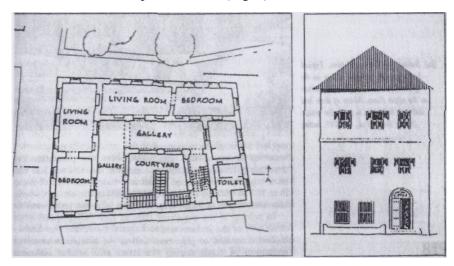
Floor plan and aspect of an Arabic house Source: Sheriff, Abdul (1992) The History and Conservation of Zanzibar Stone Town, London: James Currey.
